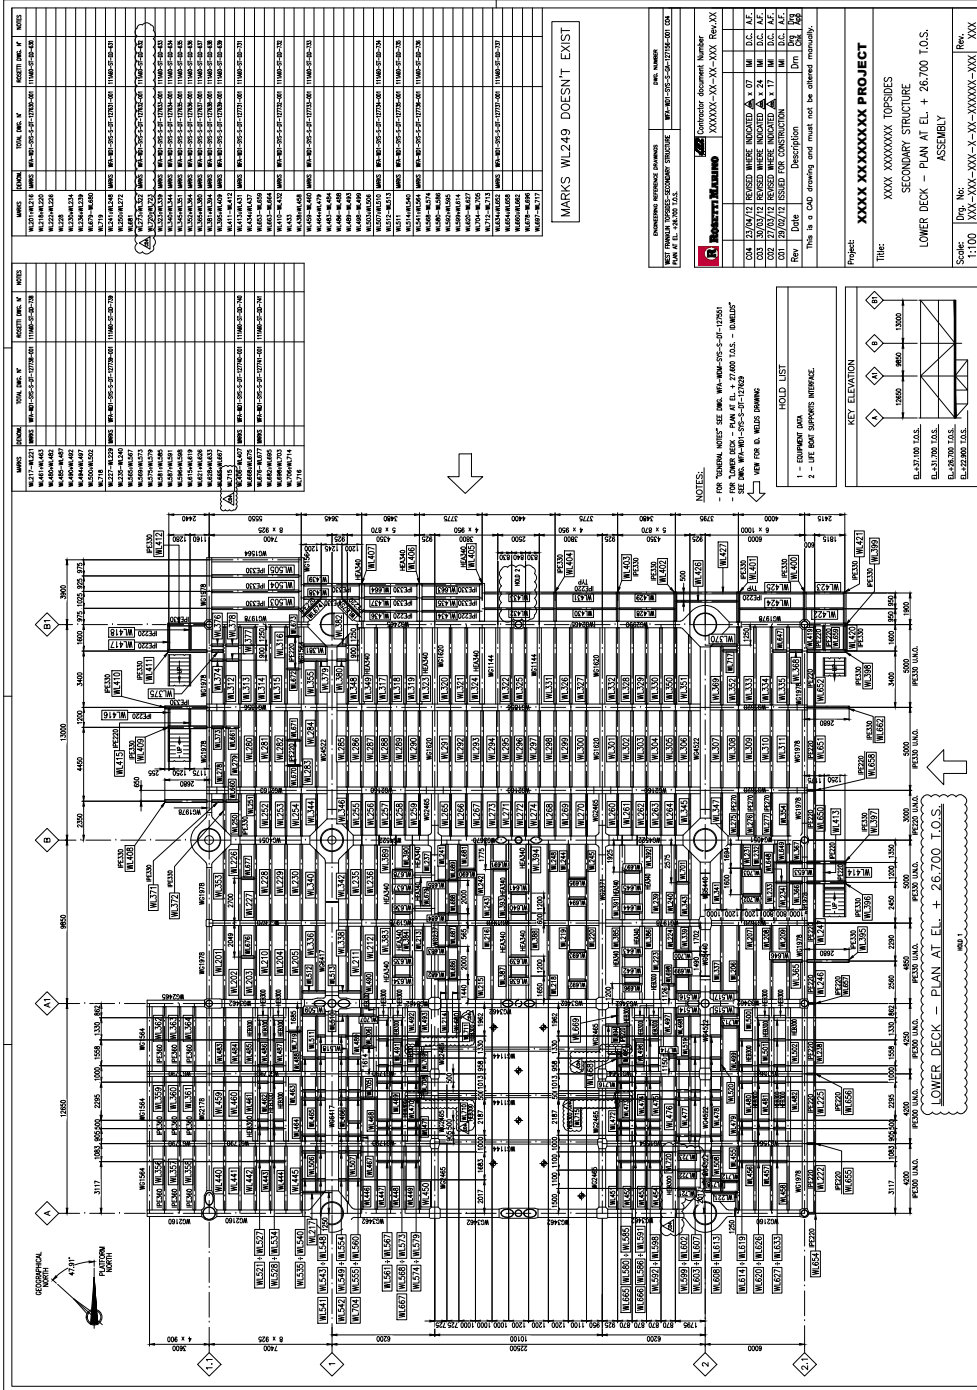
Lower level deck - Shop drawing - Plan view - Secondary structure
